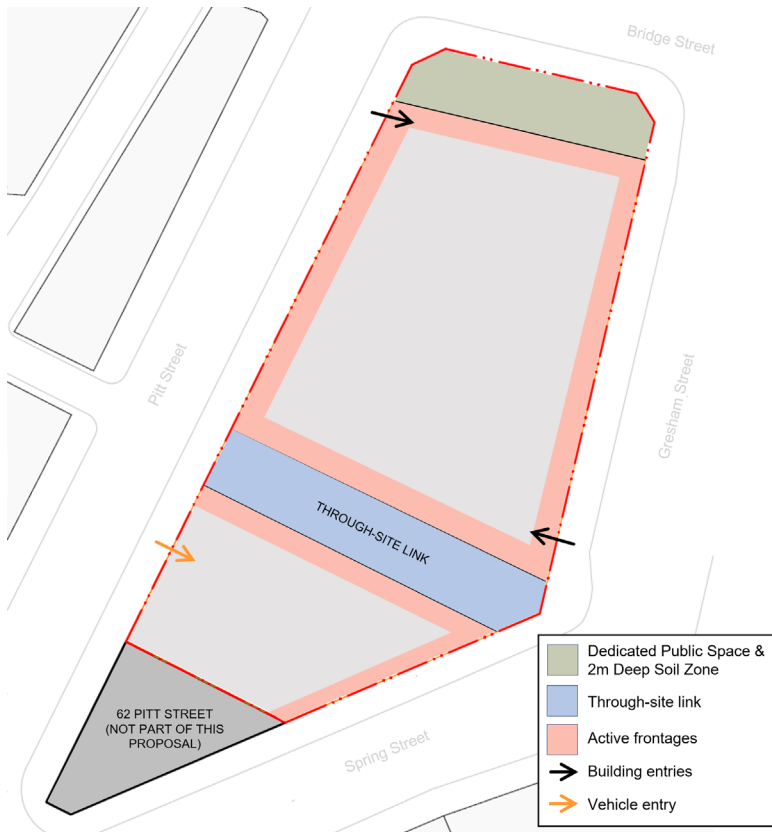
xx 56-60 Pitt Street and 3 Spring Street, Sydney – Structure plan
